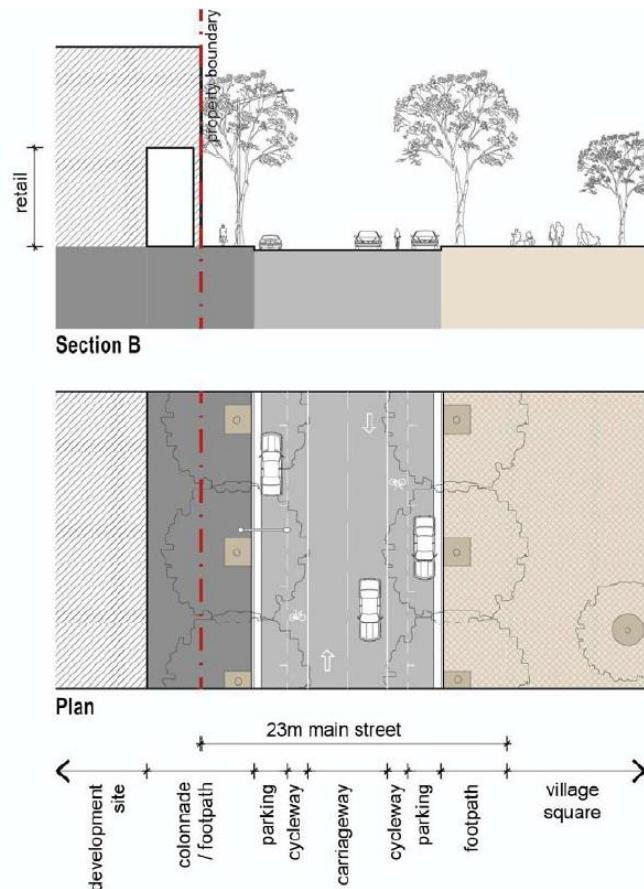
23m Road Reserve (Uhrig Road)
